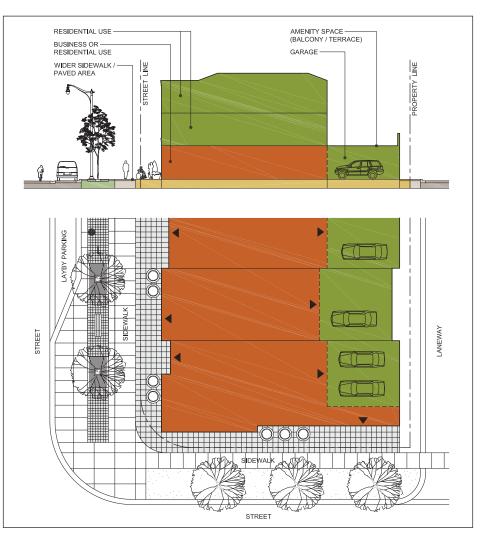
Conceptual cross-section and plan siting for typical live-work townhouses.
